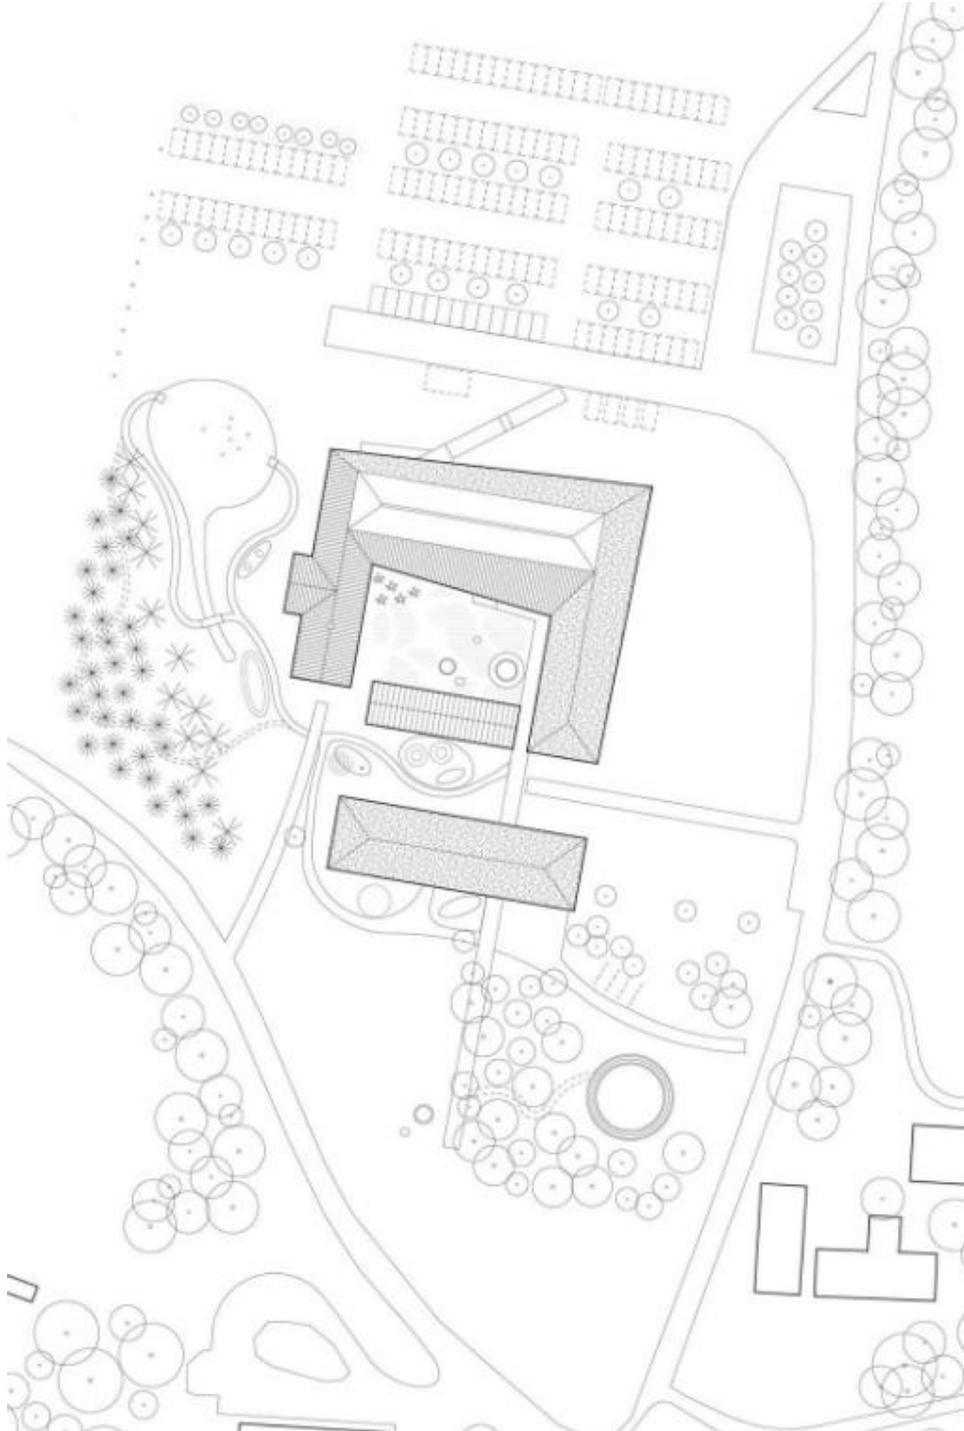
Site plan (Illustration: Dorte Mandrup)
